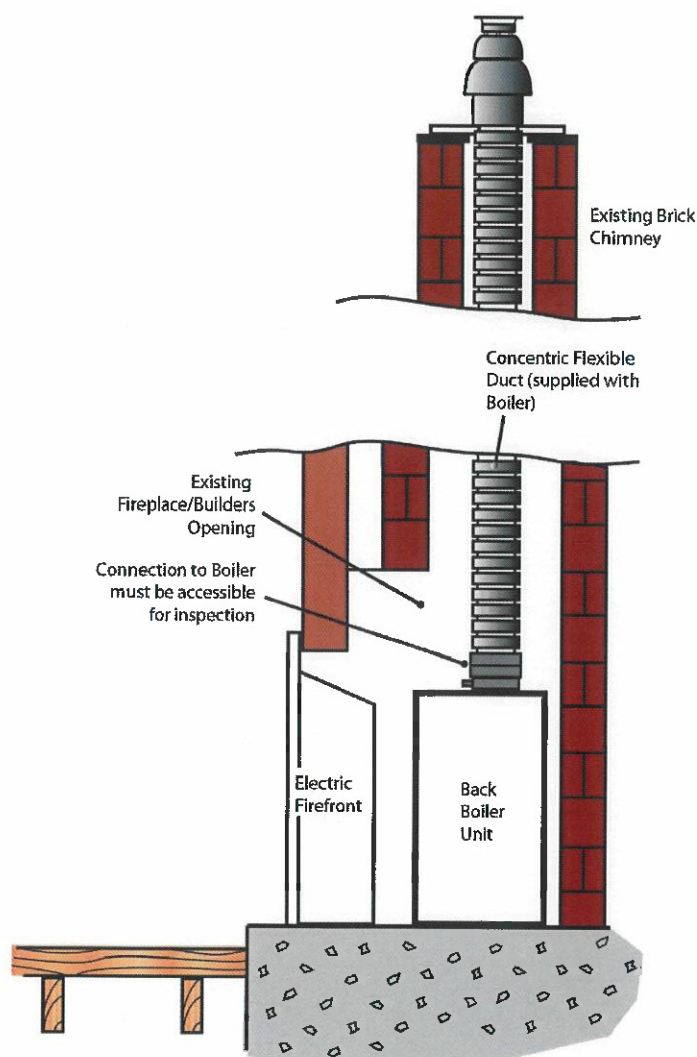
Vertical condensing flexible chimney system in constructional chimneys where the flexible chimney is connected to a boiler in an existing fireplace/builders opening.
